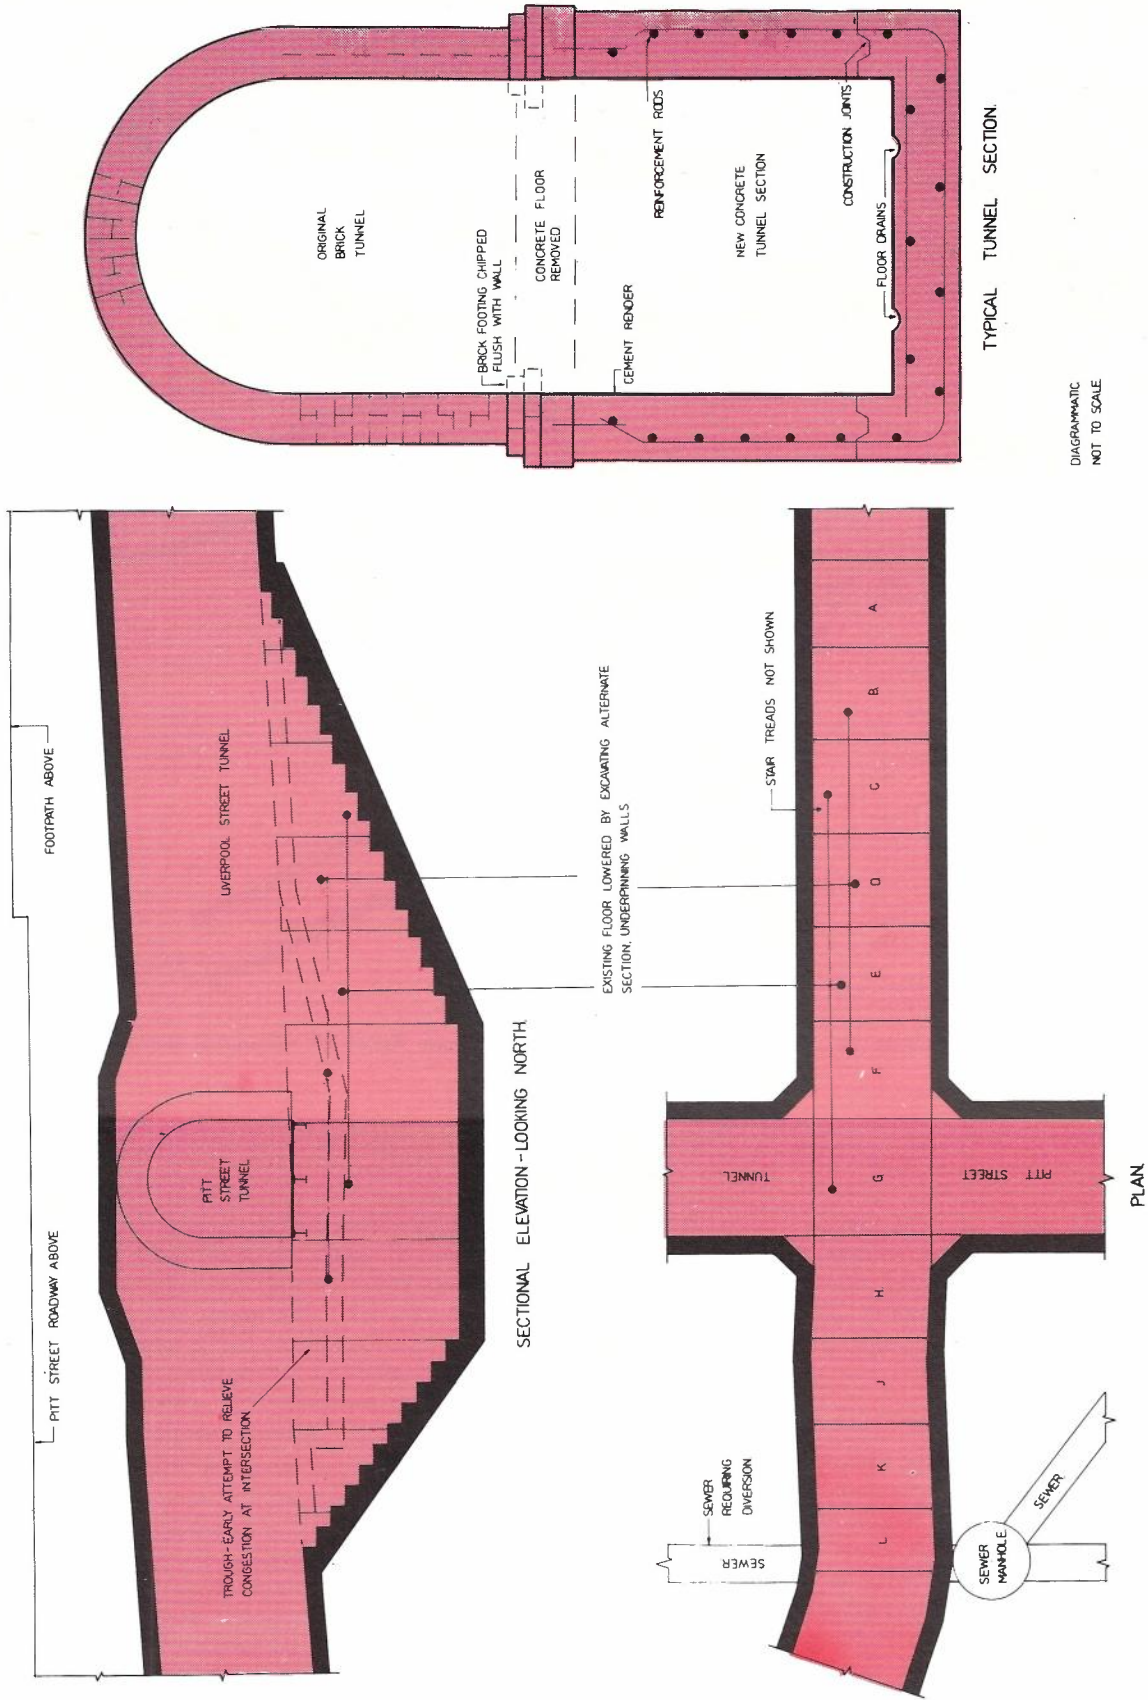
Underpass, Intersection—Pitt St. and Liverpool St. Tunnels (Method of Construction).
